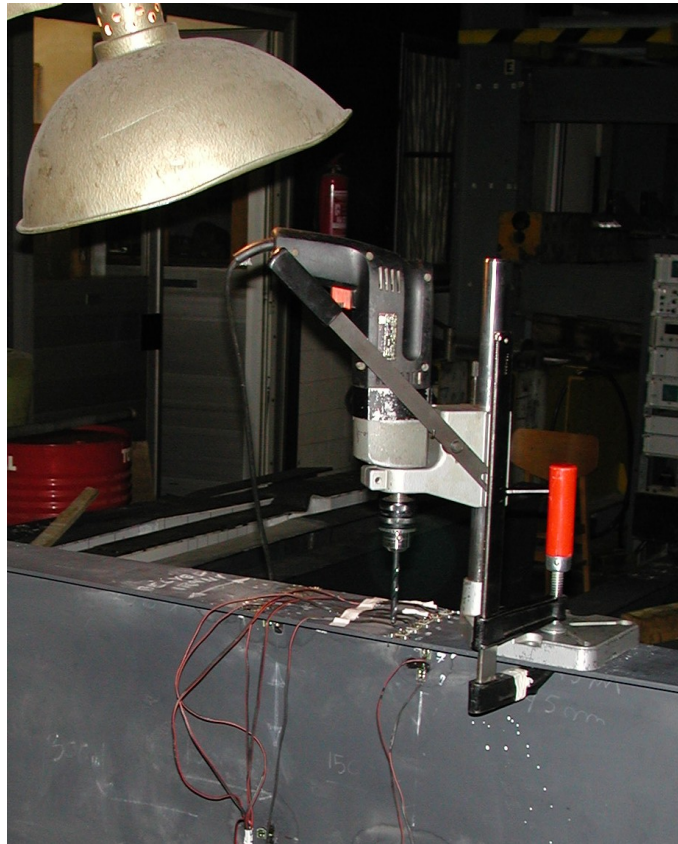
Drilling stand and drilling machine used in the measurements.
